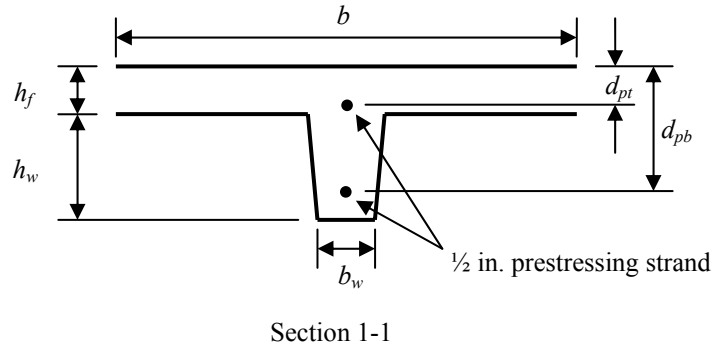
Illustration. UHPC Transverse Strip Cross Section
